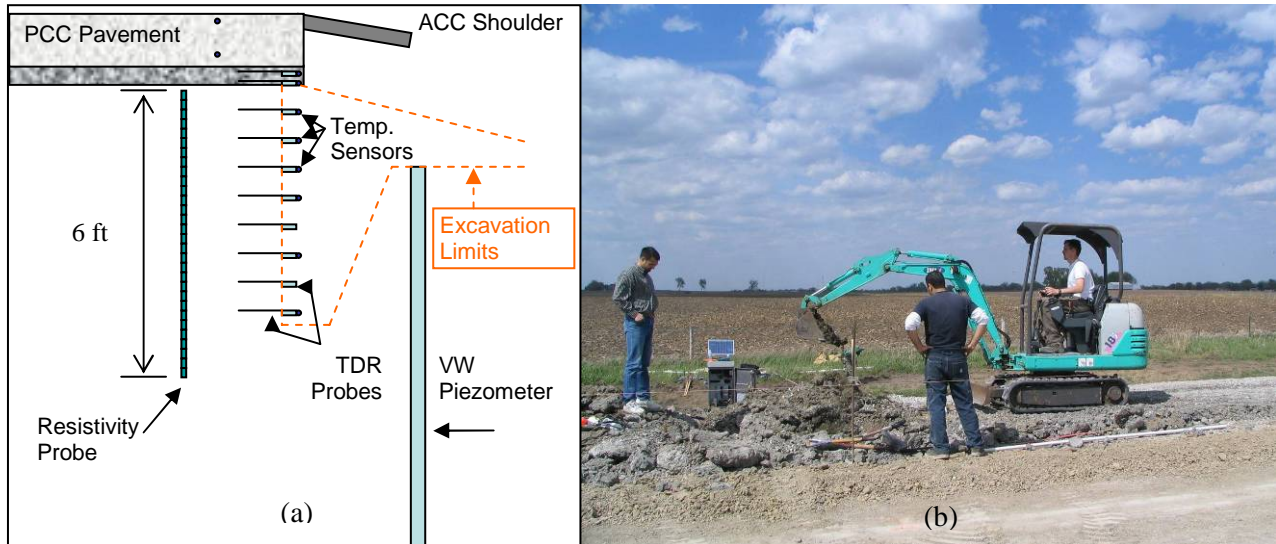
Instrumentation: (a) Cross section view of installation, (b) Installation at site
